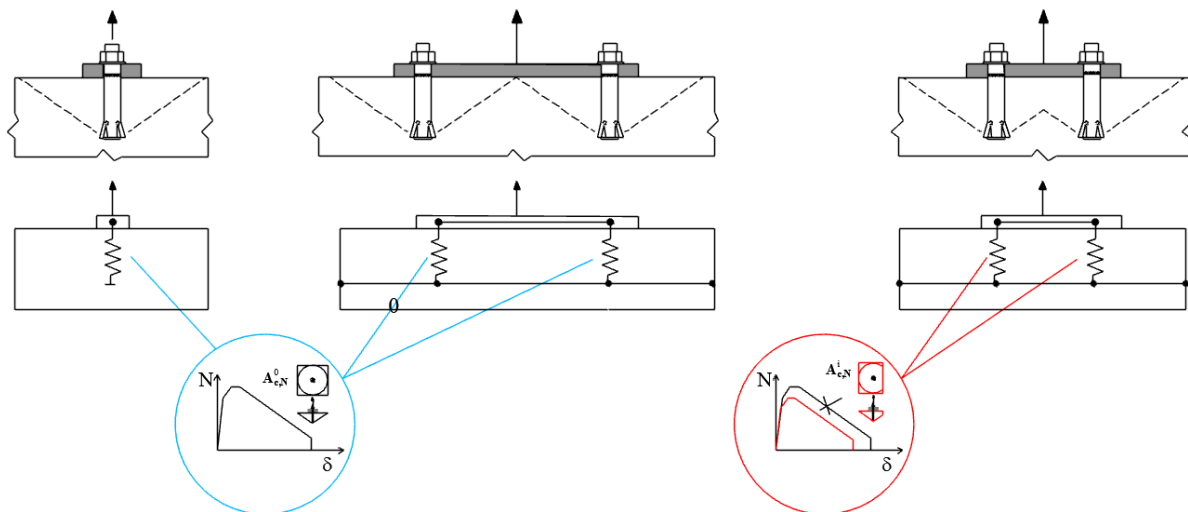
Spring properties (typical) for individual anchors of a group in case of concrete cone failure
